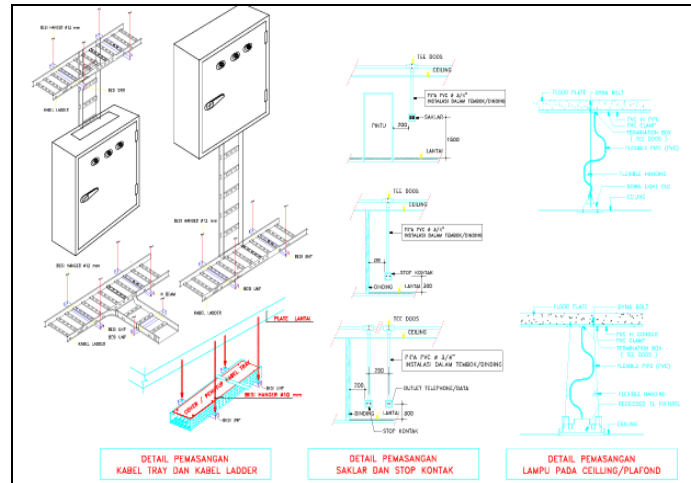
Detailed Drawing of Panel Installation, Cable Tray, and Lights
